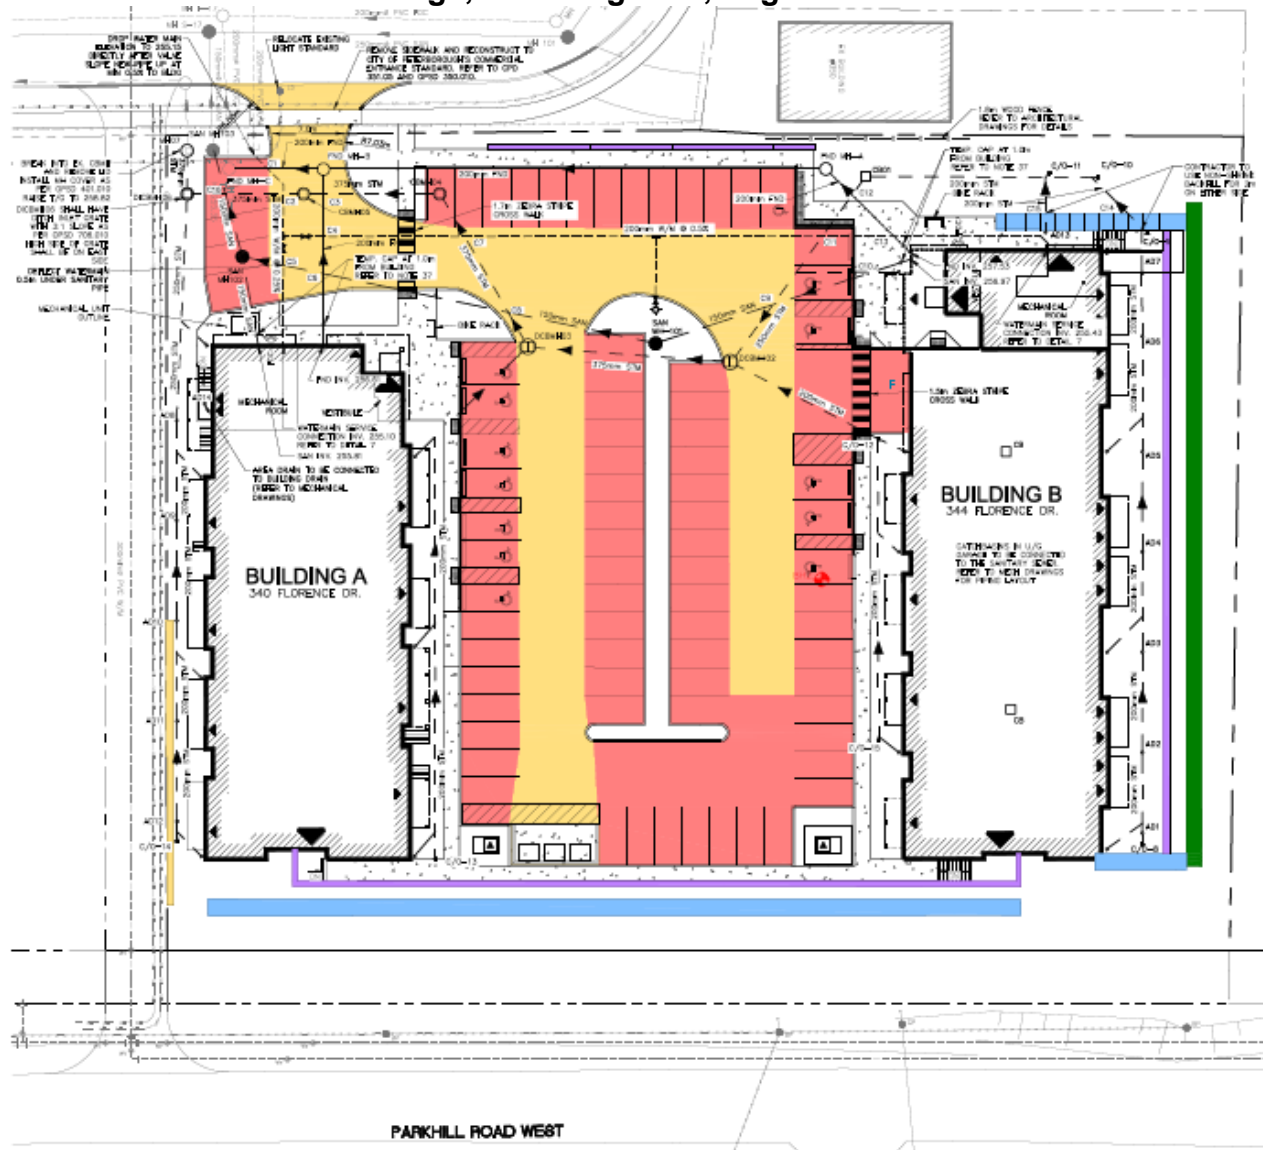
Exhibit B – Site Plan Drawings, East and West Building Elevations, Page 5 of 6
